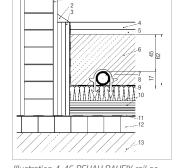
REHAU RAUFIX rail as a pipe carrier element with installed RAUTHERM S pipe
